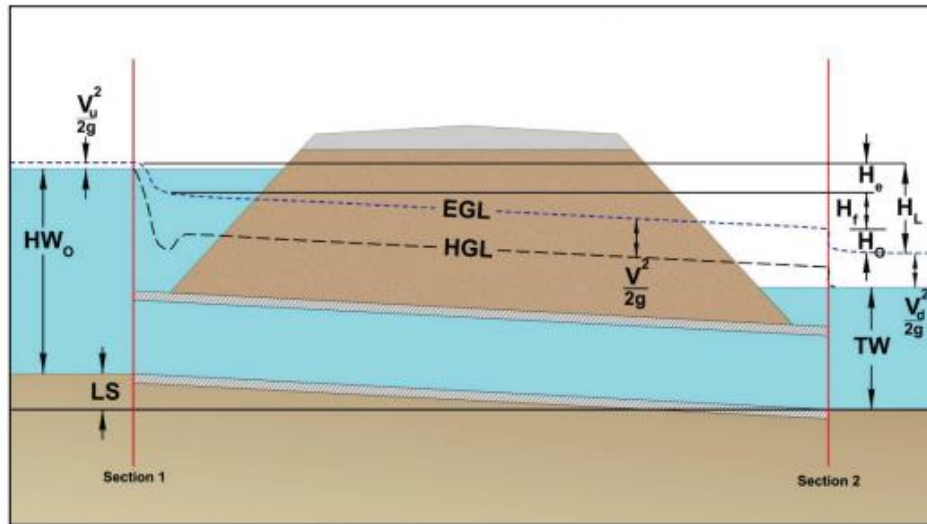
15. Example of Energy Loss in a Culvert (Outlet Conditions)
